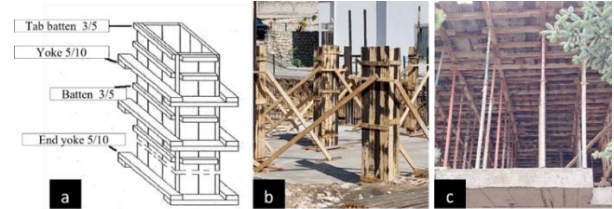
Traditional timber formwork system: (a) column formwork elements [24], (b) column formwork manufacturing, (c) slab formwork manufacturing
